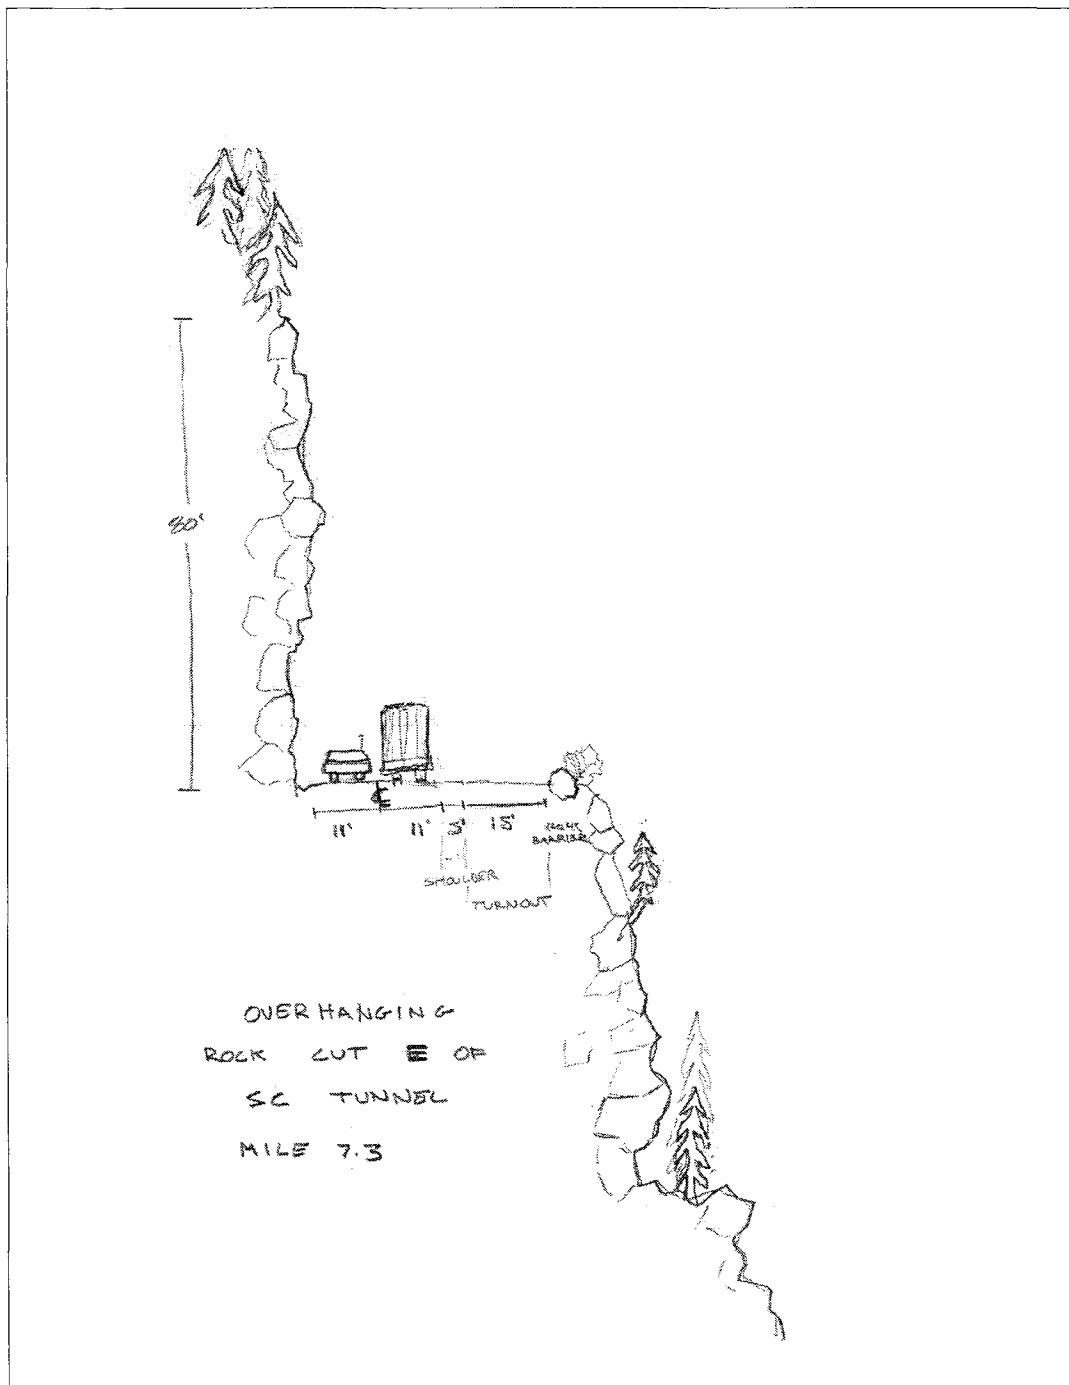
Contemporary sketch showing typical cross section on north side of Stevens Canyon at Stevens Ridge (MORA 2004).
